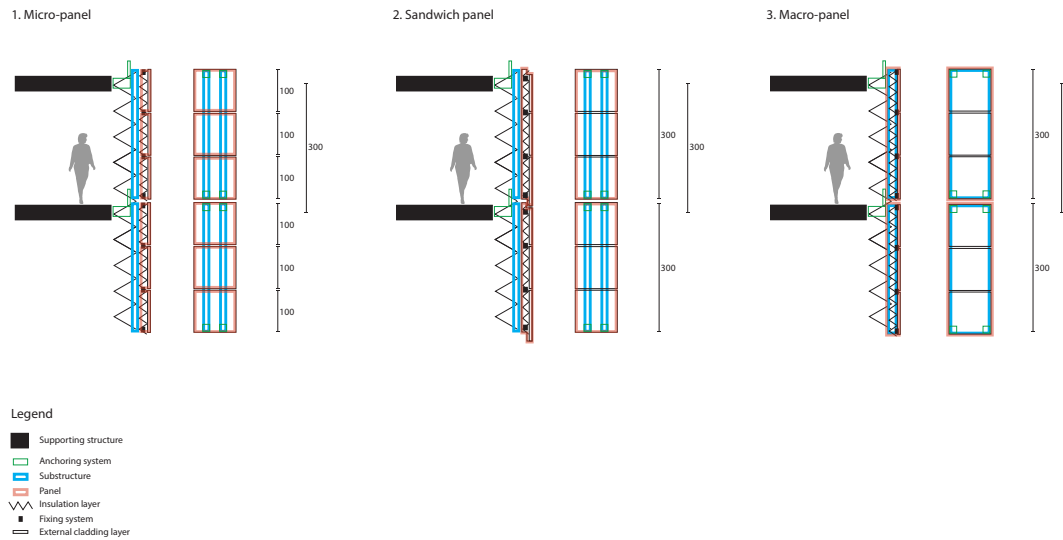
First preliminary concepts of the offsite prefabricated façade. In red pre-assembled panel units, in blue substructures, in green anchoring system, zigzag line for insulation layer, filled black for building slab
